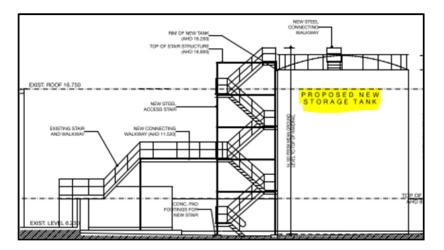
Eastern side elevation of the proposed new biomass storage tank highlighted in yellow (Source: extracted from the submitted plans).
